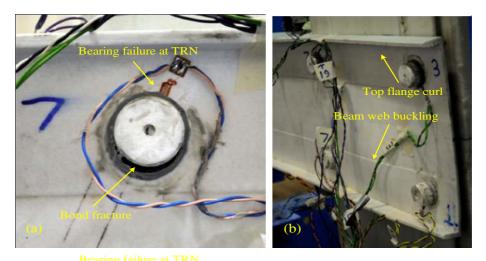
SPJ-2 failure mode: (a) bearing failure; (b) beam web local buckling.
